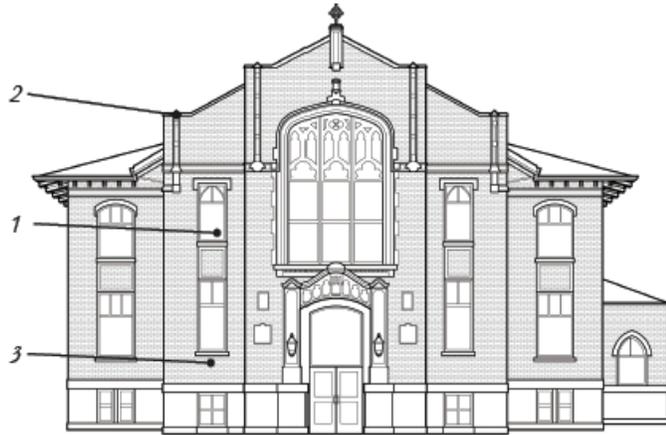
of Collegiate Gothic architectural style, Kieboffer Hall at 329 School Street, North Central College
